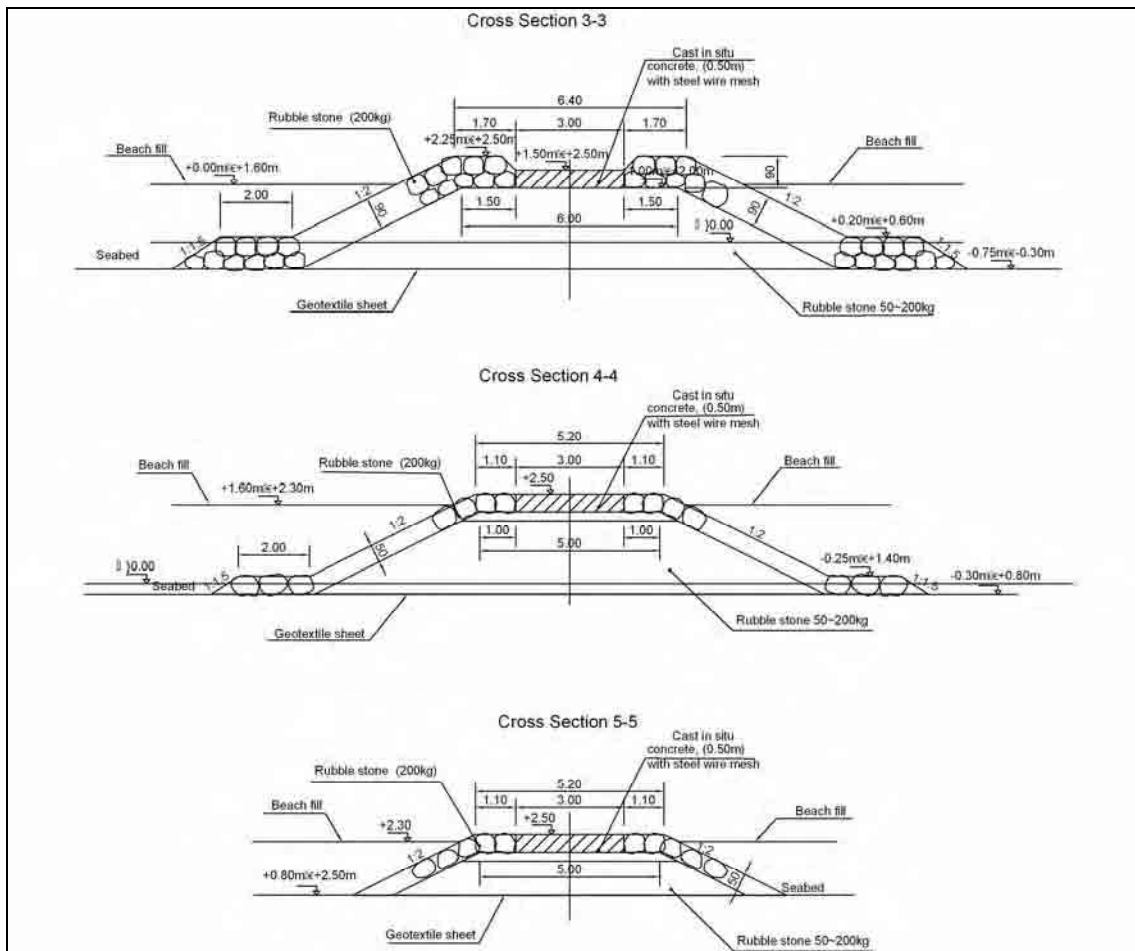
(2): Cross sections 3-3, 4-4, and 5-5 of sand-retaining jetty
